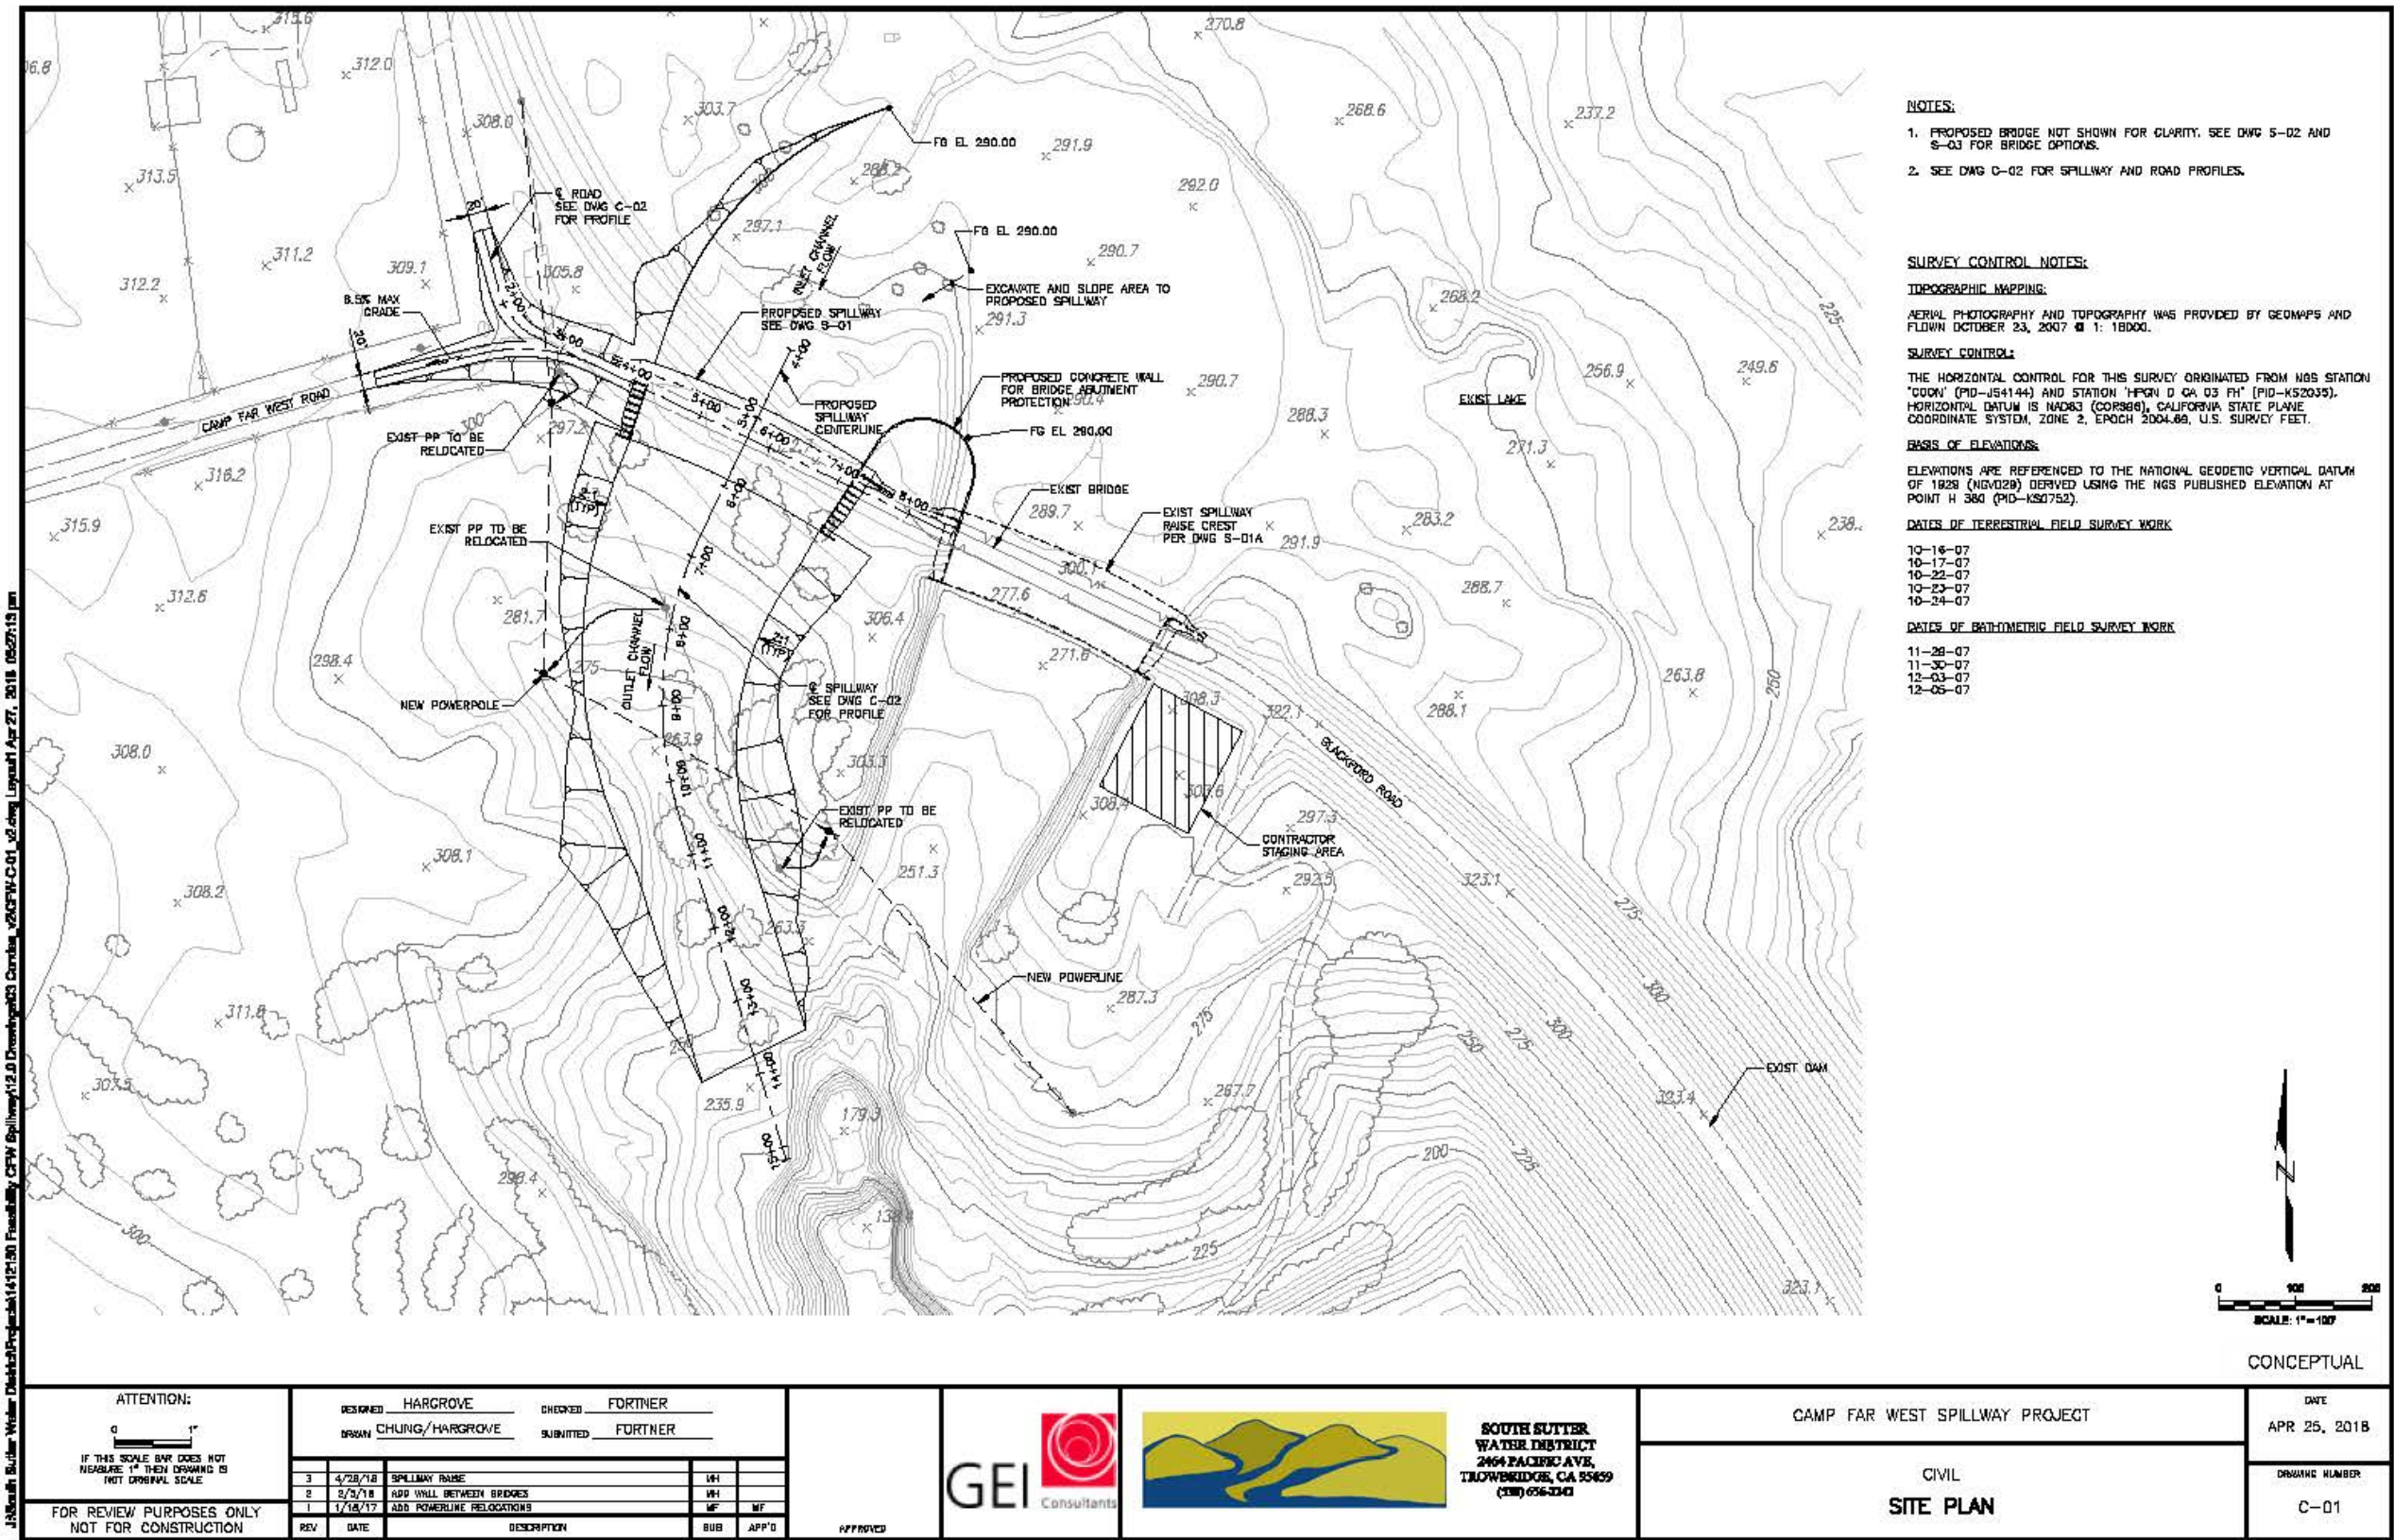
Conceptual level plan for Camp Far West Reservoir Pool Raise – general plan.
